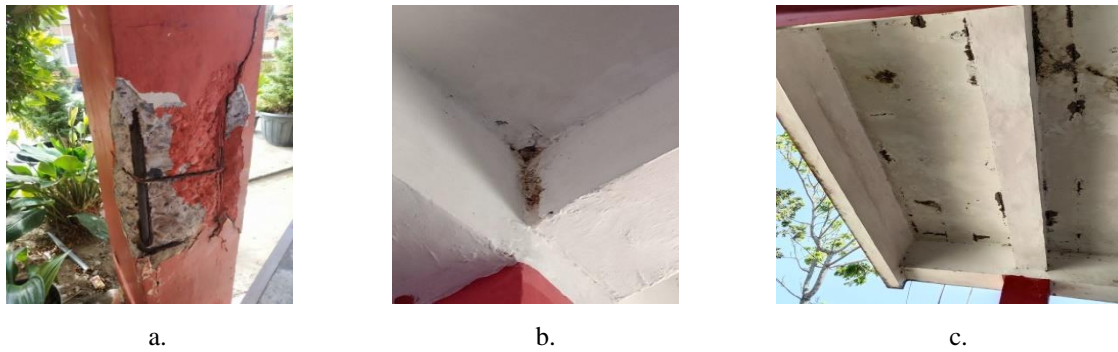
a. Spalling Columns, b. Broken Joint Beams, c. Floor Plate Spalling
